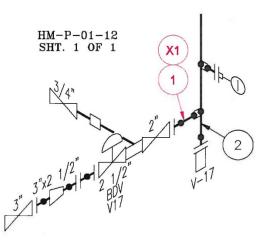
A partial view of isometric drawing HM-P-01-12, sheet 1 of 1. The location of profile radiography (X1) is shown in red.
